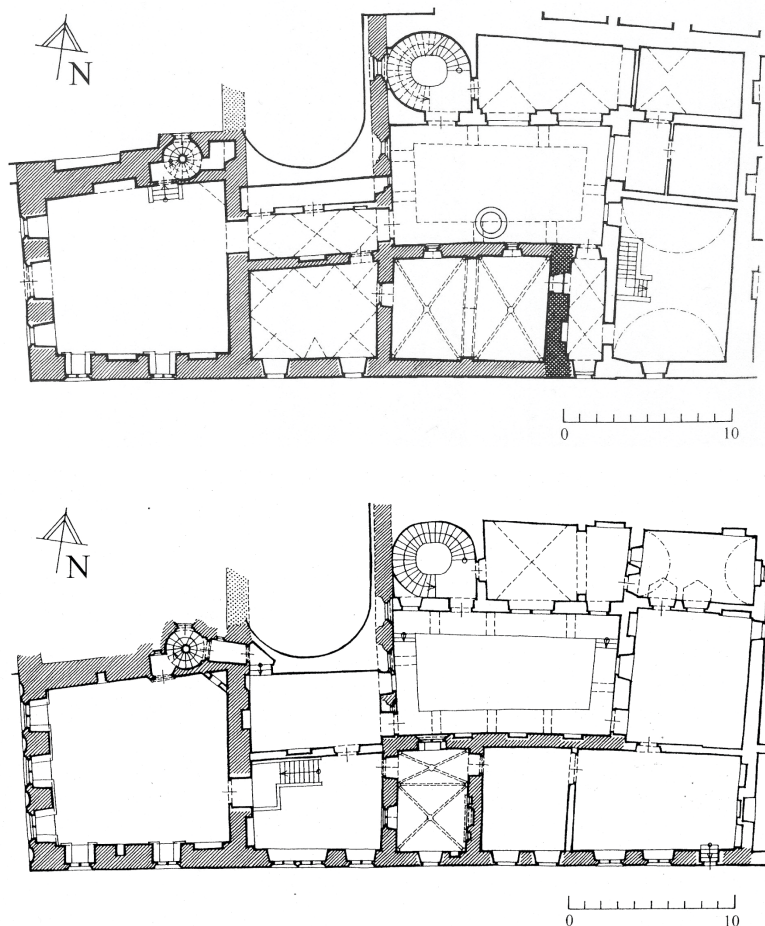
Prague, house U zvonu, floor plan after J. Mayer and K. Benešová (1971). In the intersection between the tower and the wing there is the spiral staircase, which connects all levels from the ground floor to the attic. Interpretation of the northern portals providing access to the staircase in figures 28 and 29.
